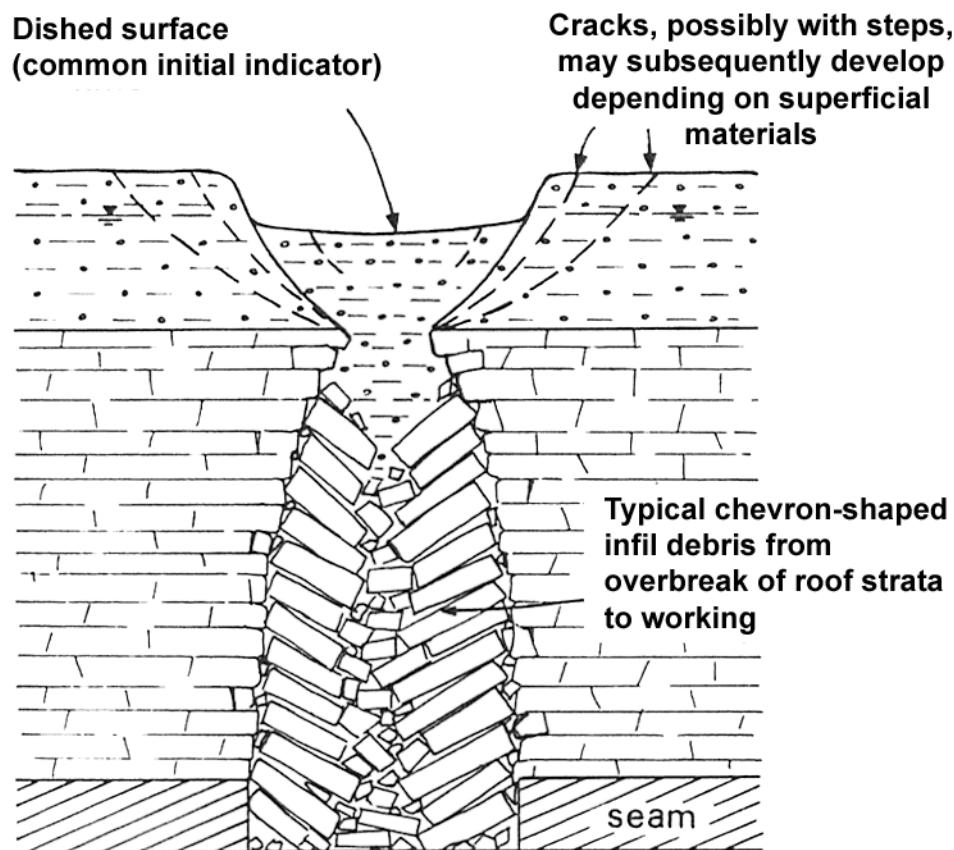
Typical cross section through a fully developed crown hole (after Attewell and Taylor, 1984).
